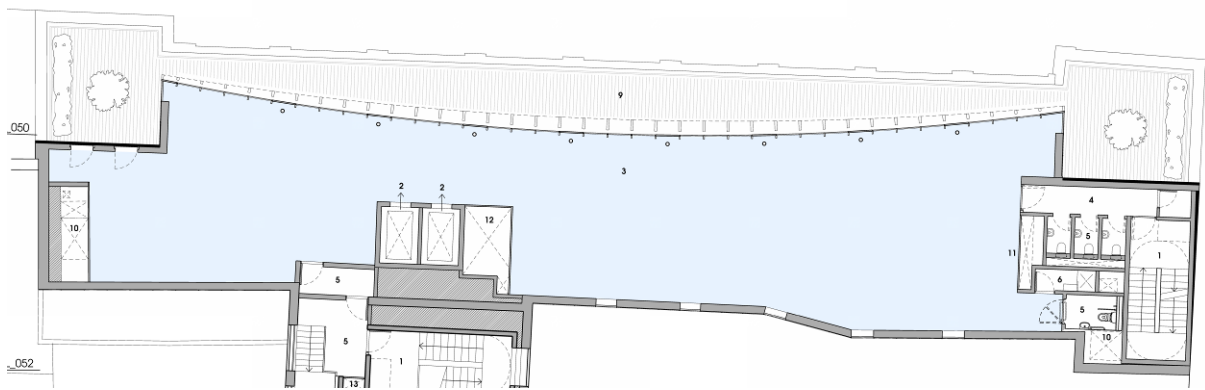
The proposed office floorplate and terrace to Shorts Gardens (4th floor)
